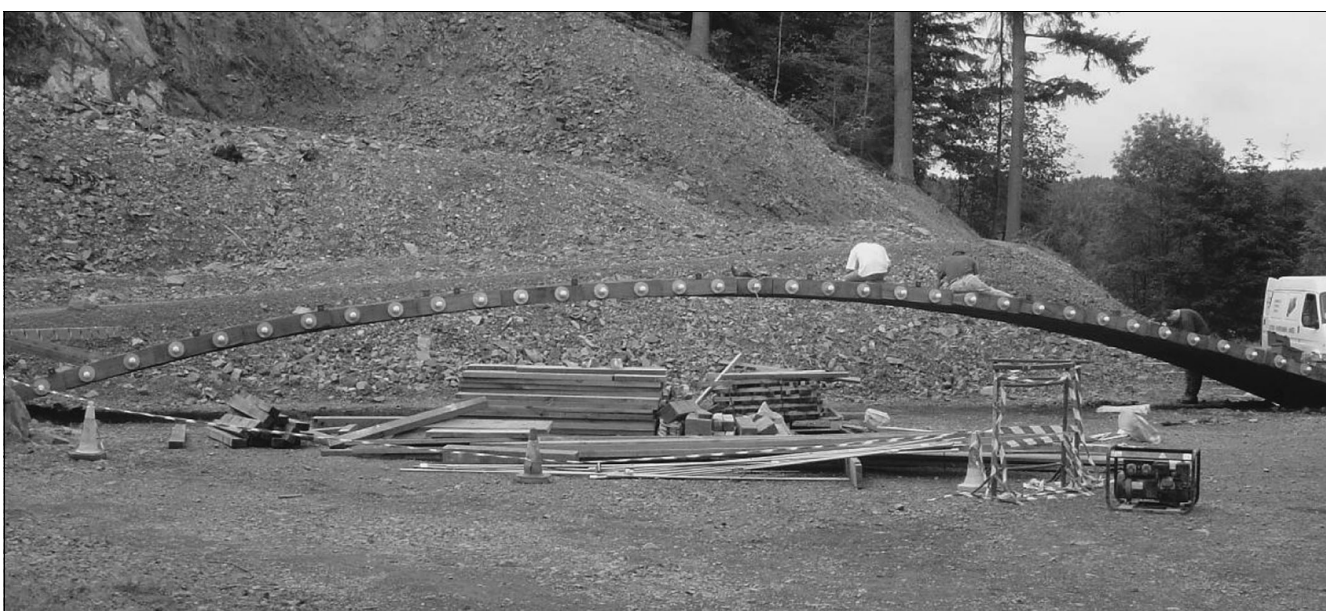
Twenty-metre span test bridge at Glentress, depth to span ratio of 1 to 100, July 2003<sup>2</sup>
